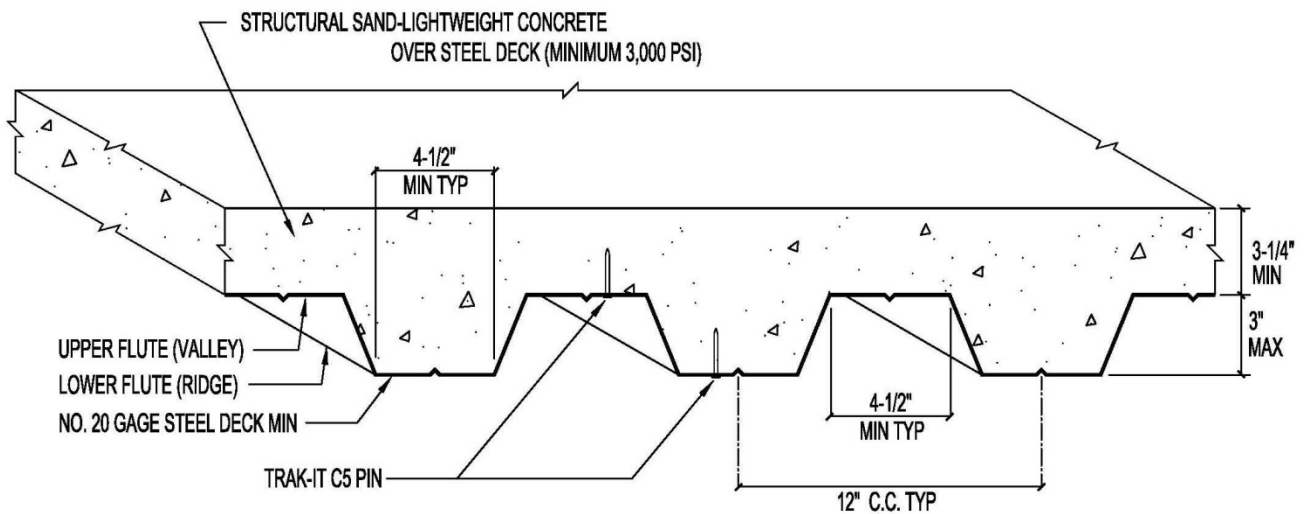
FASTENER INSTALLATION LOCATION IN 3-INCH-DEEP COMPOSITE DECK
